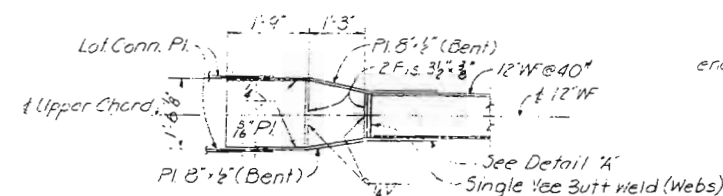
DETAILS: All field connections shall be riveted unless otherwise noted. Where desired for convenience in erection, shop and field rivets may be interchanged. All web plates and cover plates for truss members shall be universal mill plates. All gusset plates shall be cut back not more than 1/4" from the back of chord angles or channels, except as otherwise noted on the detail drawings. Access holes may be flame-cut provided exposed edges are ground smooth.
